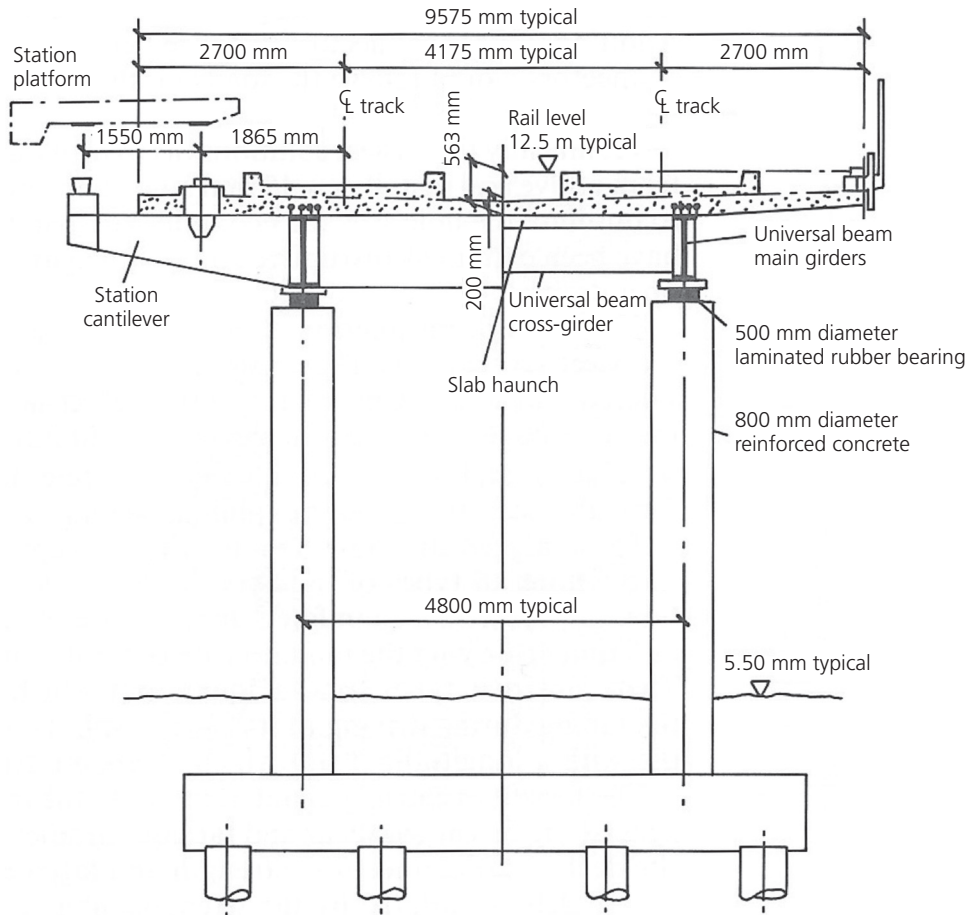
Typical DLR viaduct. © Institution of Civil Engineers
